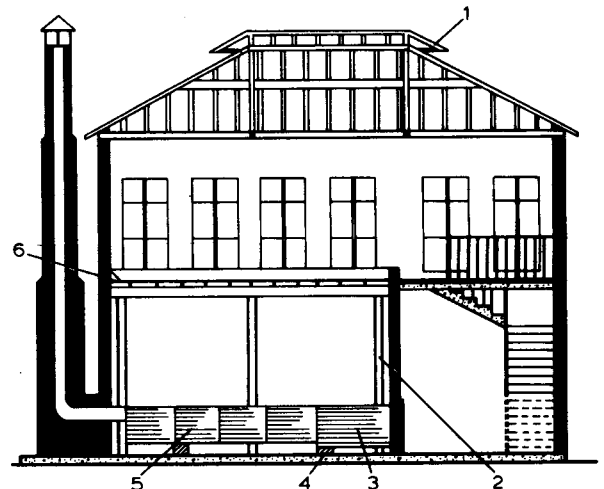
Cross section of the test drier. 1, Lantern roof; 2, drying floor supports, 3, furnace; 4, drying air inlet, 5, heat exchange tube; 6, drying floor
